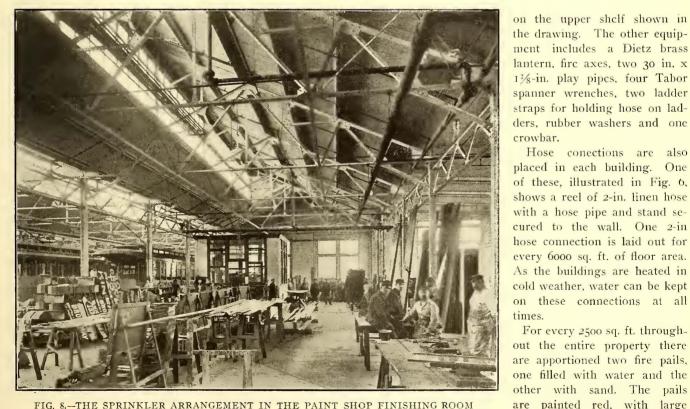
THE SPRINKLER ARRANGEMENT IN THE PAINT SHOP FINISHING ROOM
